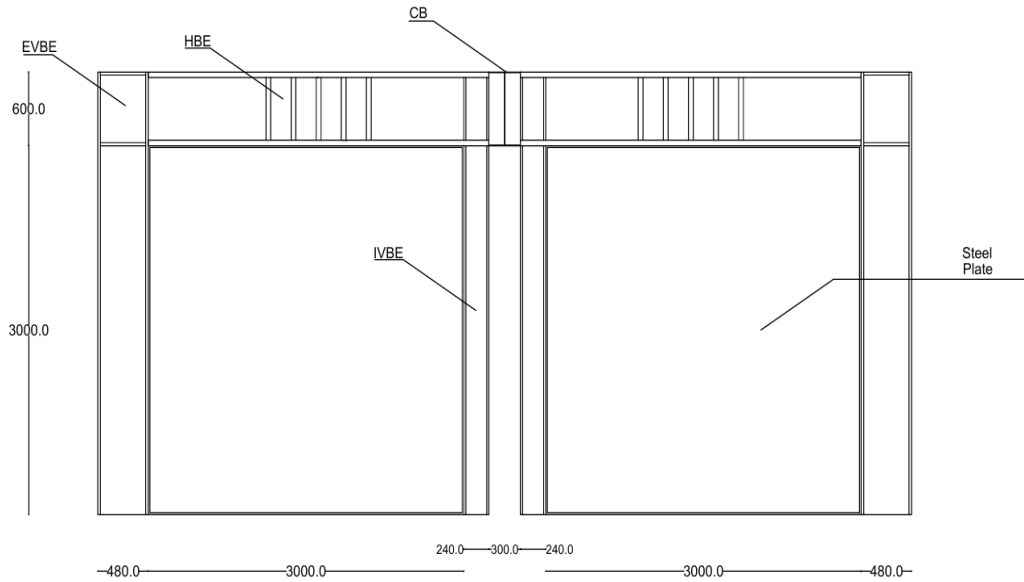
Overall configuration of the specimen with shear-dominated coupling beam behavior
